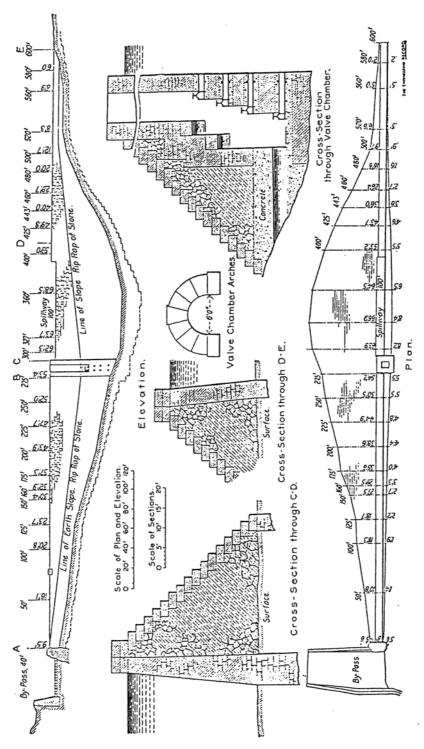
Castlewood Dam; Plans, Sections, and Elevation (Schuyler, 1909).
